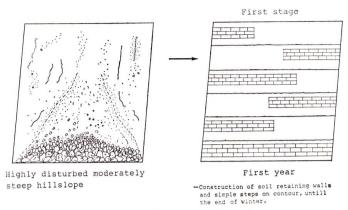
a. Slope stabilization by construction of soil retaining walls in highly disturbed hillslopes.
